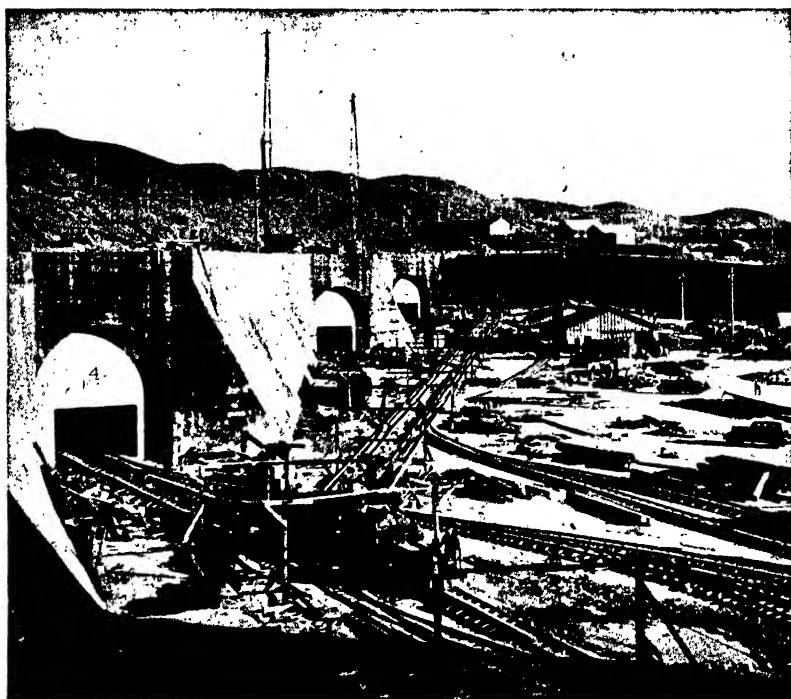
Track layout at downstream portals of Fort Peck Dam diversion tunnels, an example of well-laid track. Haulage was by trolley locomotive; 36-in. track gage; 56-lb. rail. (U. S. Engineer Dept. Photograph.)
